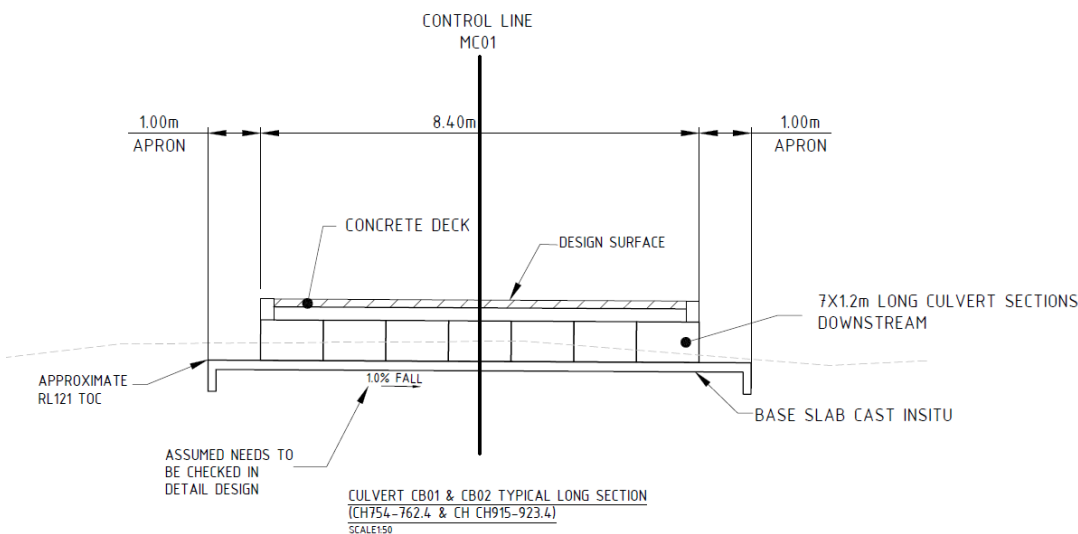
Site Access Road Low flow Culvert Crossing Concept Design
